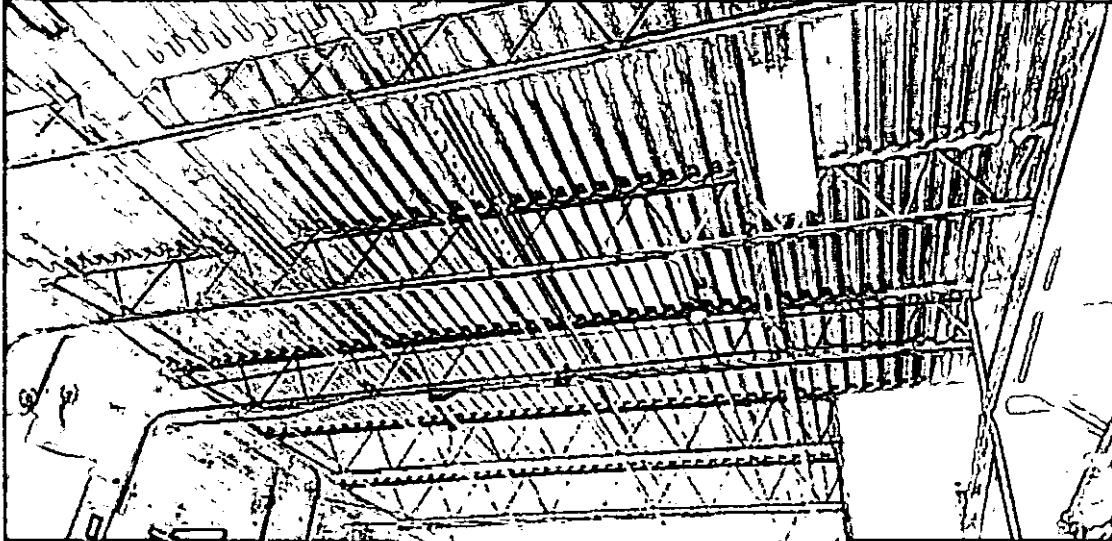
Exposed steel bar joists system exposed to the interior in the rear part of the building. In front offices the roof deck and roof joists are concealed by the finishes and were not inspected, but likely to be same or very similar shape.
